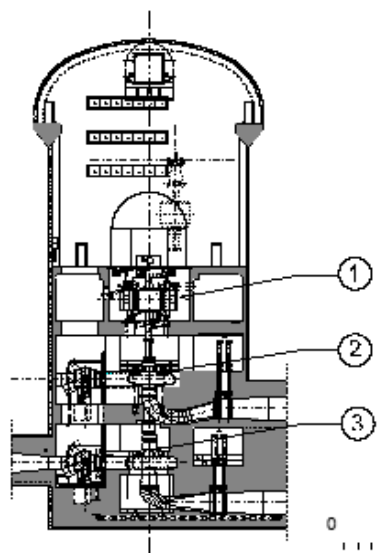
Pont Ventoux-Susa Pumped Storage Hydropower layout
